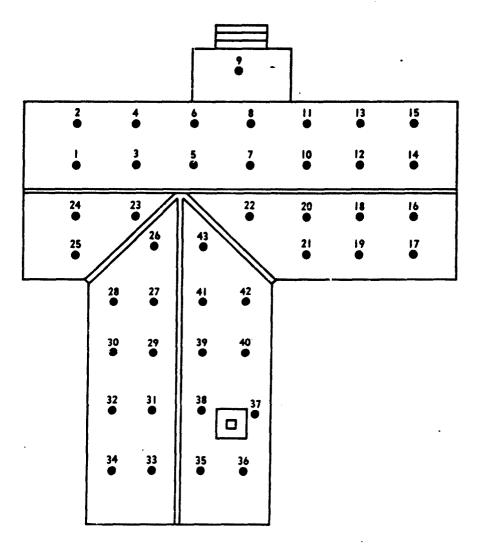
Location of Reading Stations on Roof of Building on the Complex
